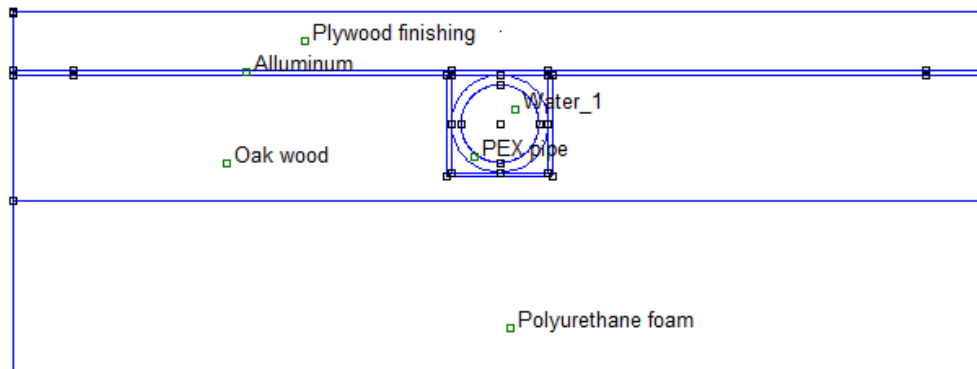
Floor structure, detailed view of the layers underneath the floor surface.
